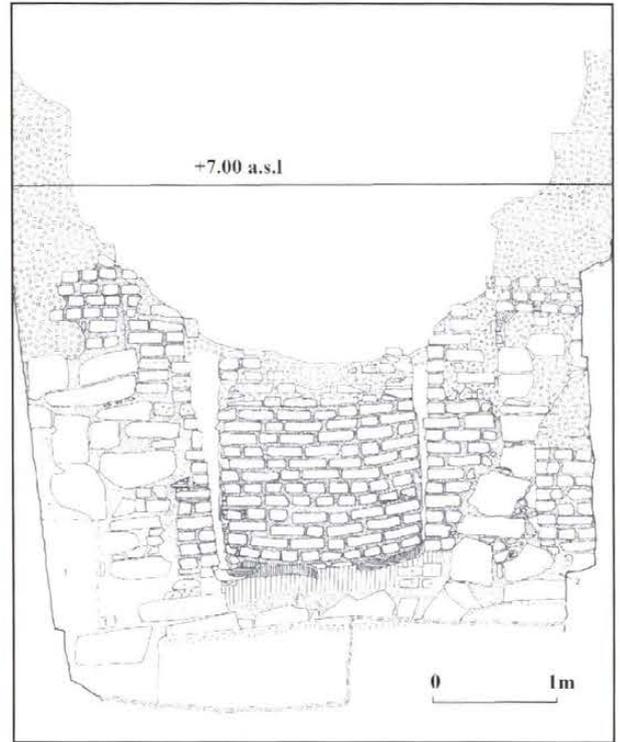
The west wall of tower C of Kuusisto Castle. The west wall of tower C originally had a brickwork opening facing outer bailey I, but this feature was already walled up during the Middle Ages. All corners of the tower had a brick pilaster, suggesting that the bottom storey was vaulted (The archives of the Dept. of Monuments and Sites, NBA. Kuusisto Castle.).
